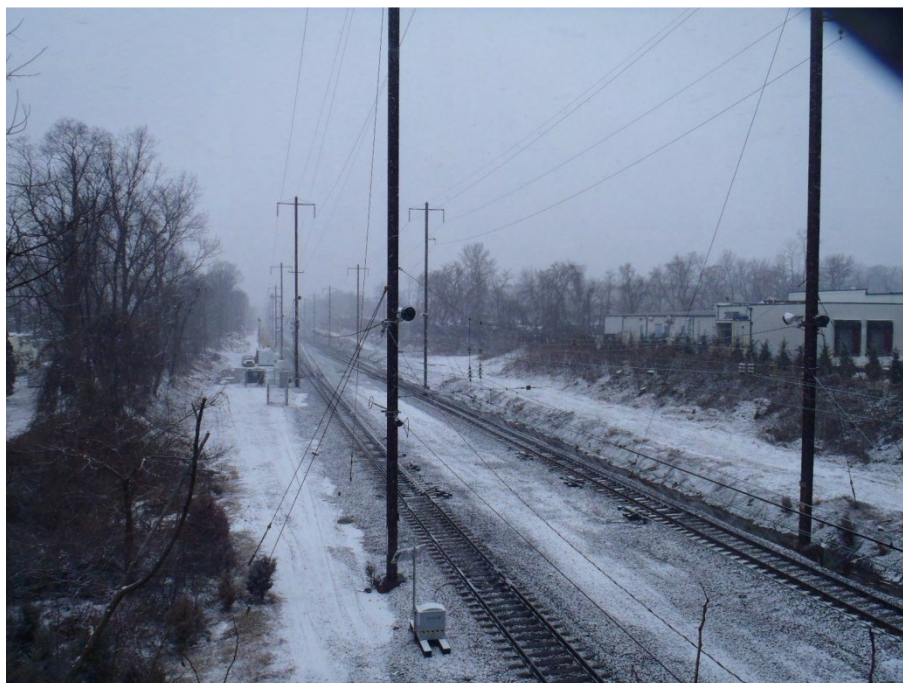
General view of embankment supporting railroad and railroad bridge over St. John Street, facing southwest; Note the presence of multiple underground utilities within the vicinity of the berm.
